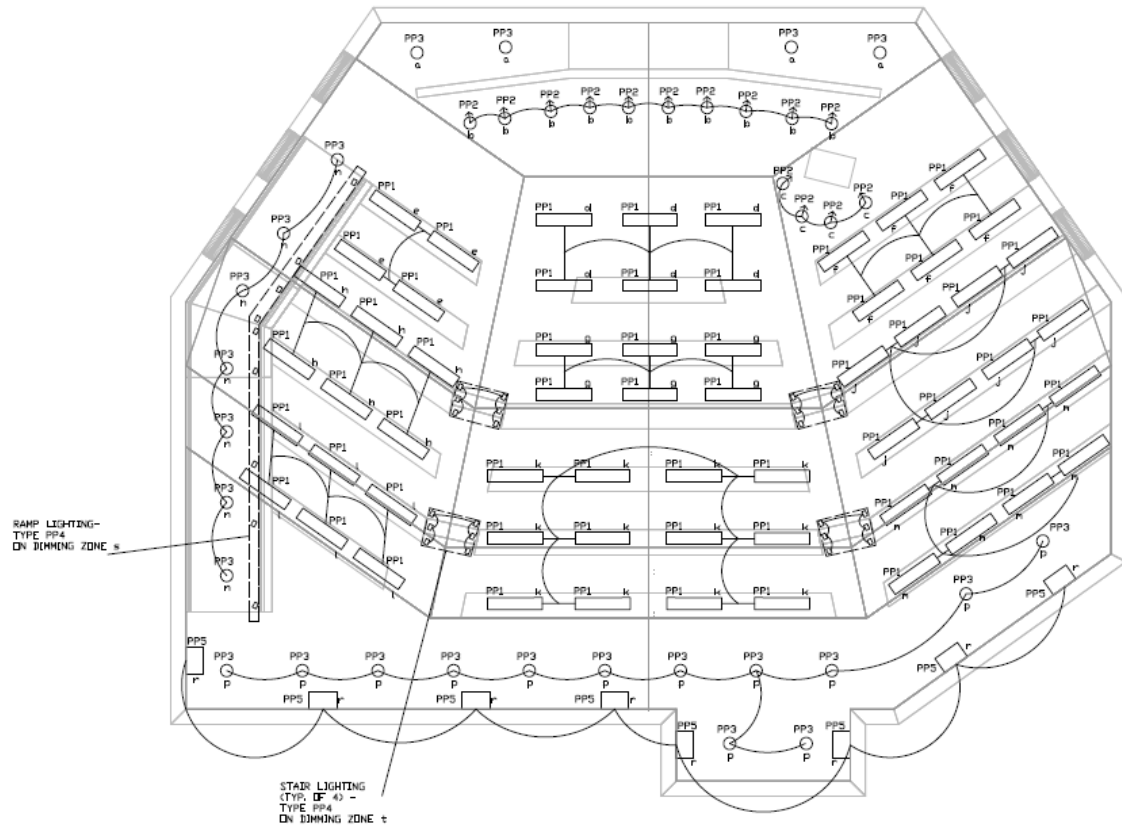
First Floor Circuiting Plan – Lecture Hall
